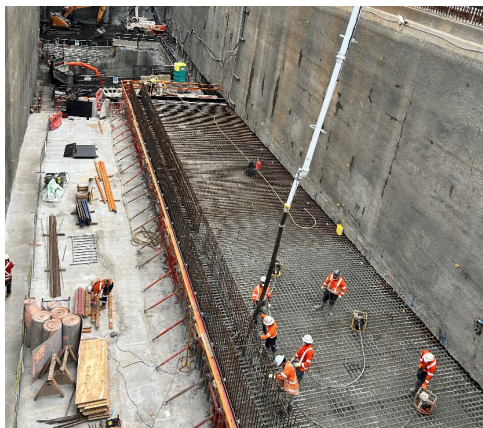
Clyde Dive site – Dive Concrete base pour
